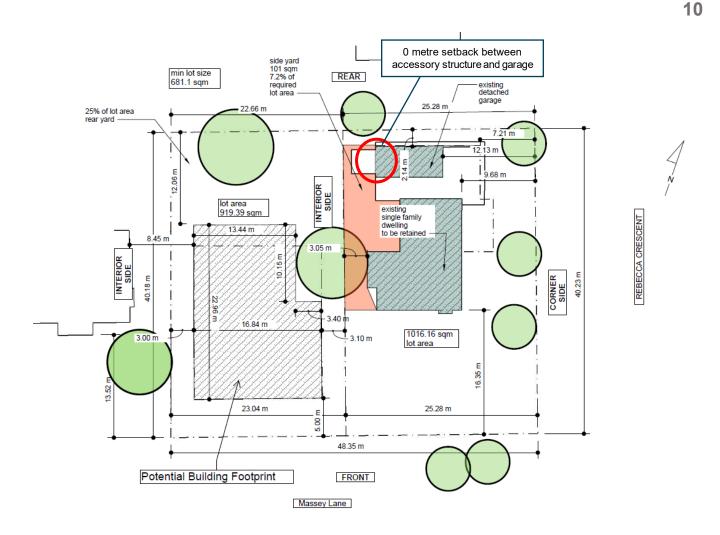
Concept plan of the severed properties with the existing setback between the accessory structure and garage outlined in red
